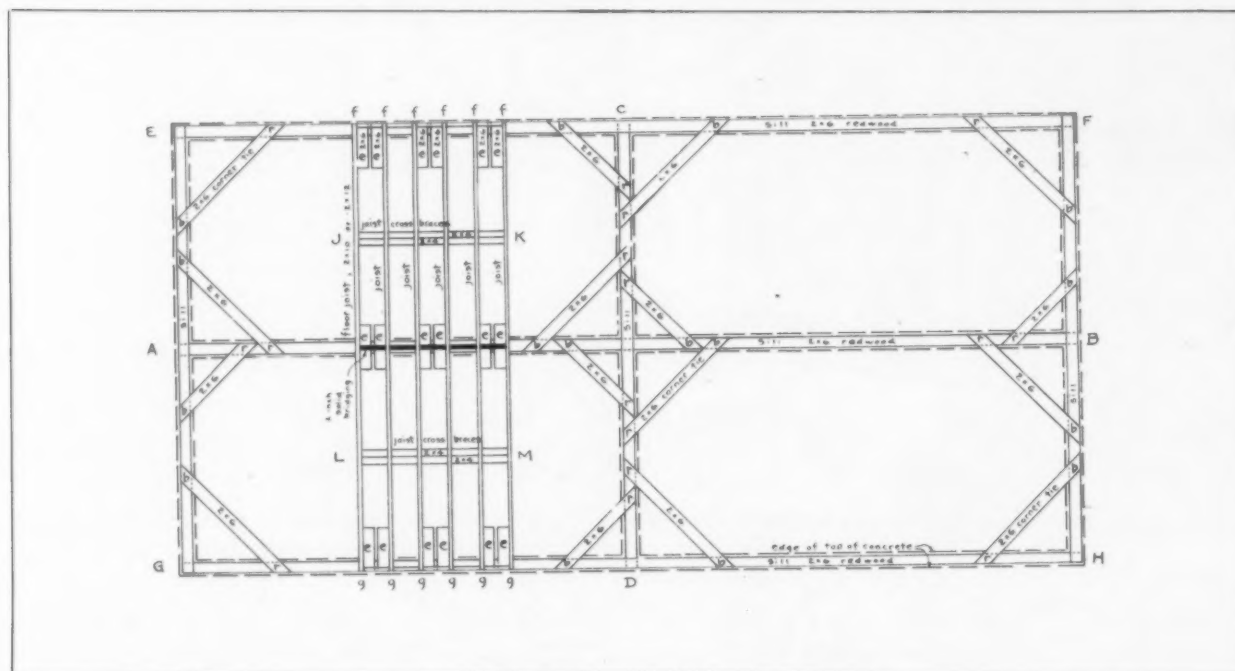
Corner Ties for Sill and Plate Underpinning. Method of Attaching and Bracing Floor Joists
